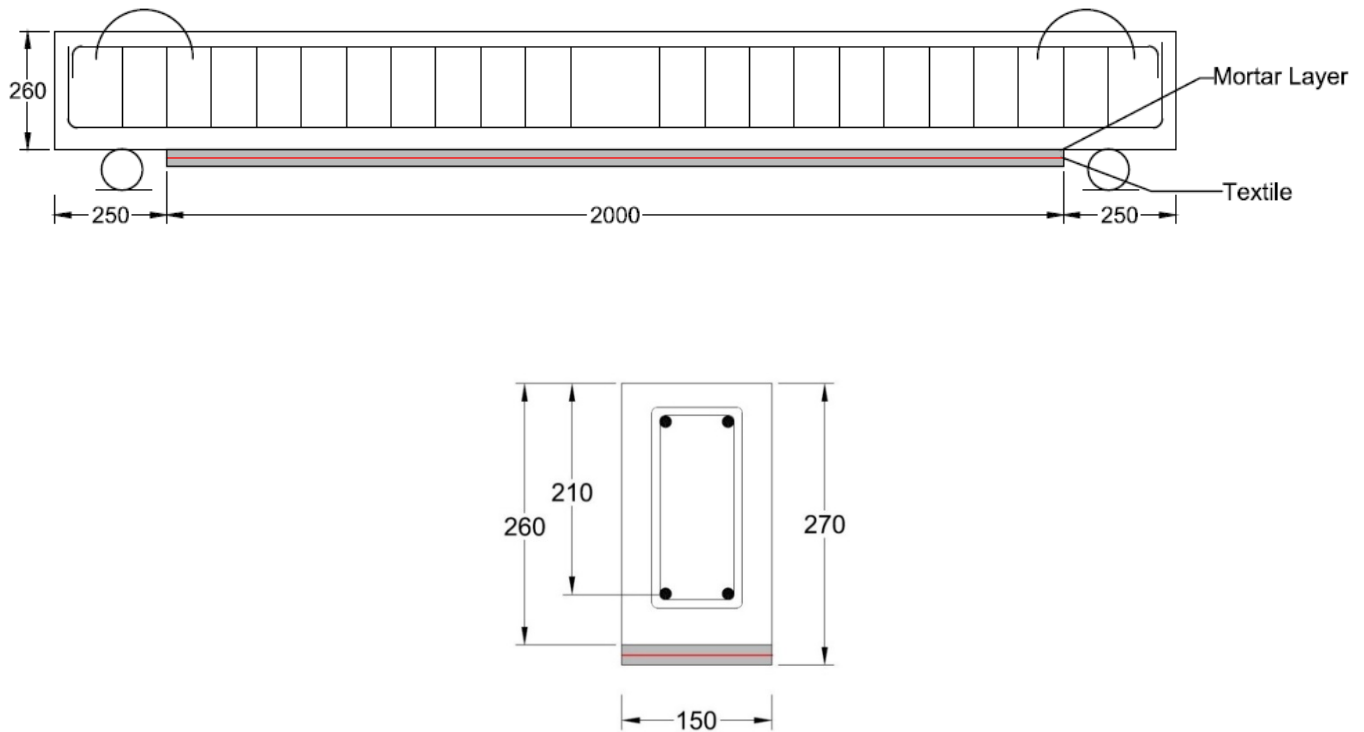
Longitudinal and mid span cross-section of strengthened specimen
